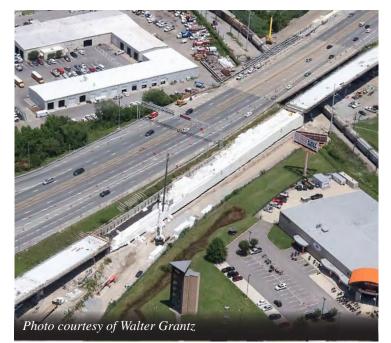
EPS embankment construction for Ramp EN, adjacent to I-264 (Portsmouth, VA).
